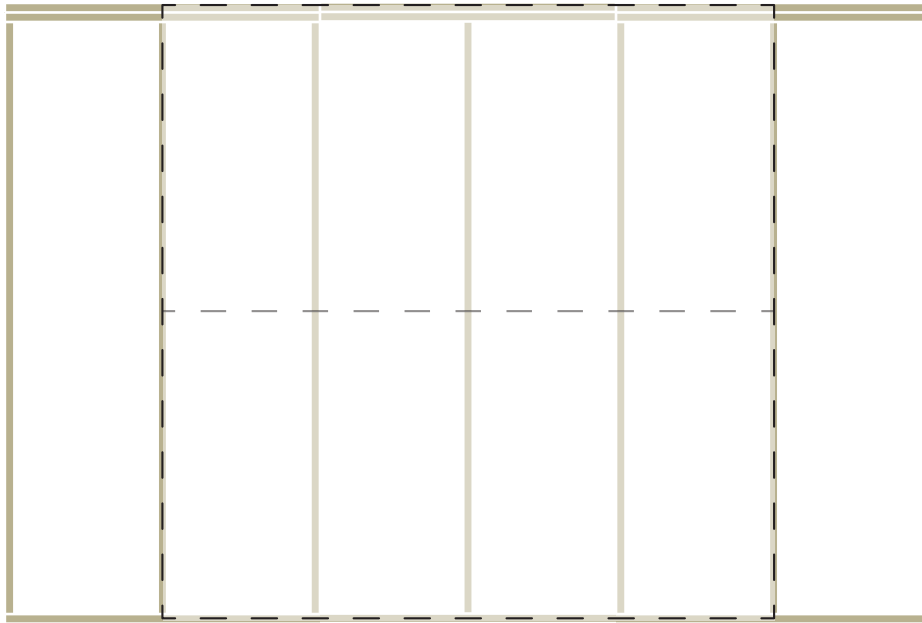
Drywall Cutting Diagram (Eight Foot Sheets).
